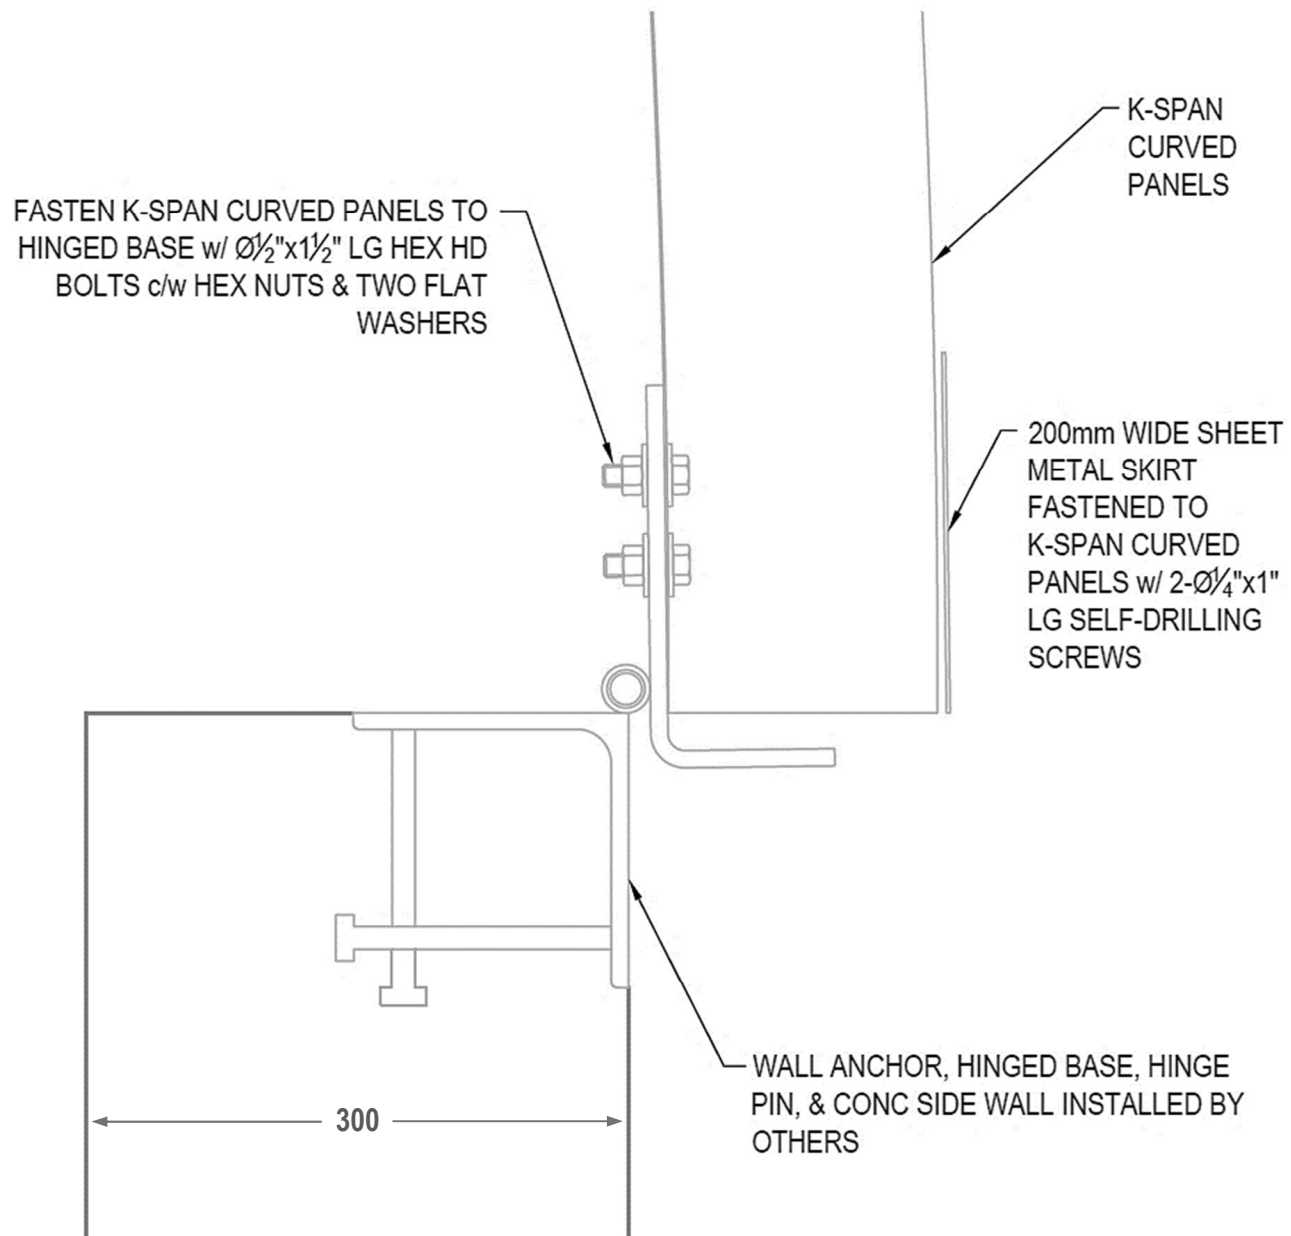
Excerpt from K-Span arch installation detail (mm) [2]
